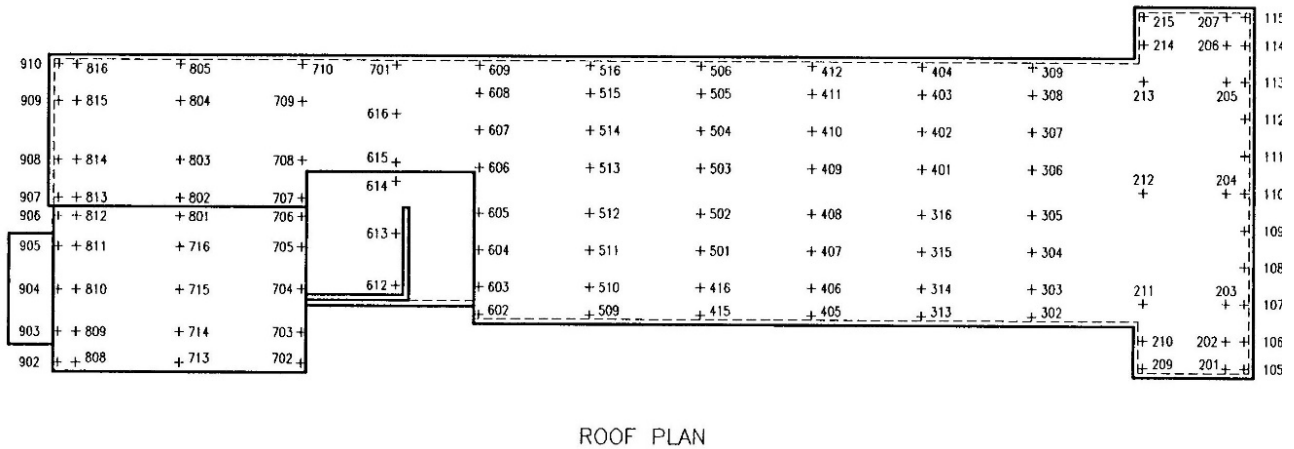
Plan View of School Showing Location of all Pressure Taps Used in the Wind Tunnel Tests (North is towards top of page)
